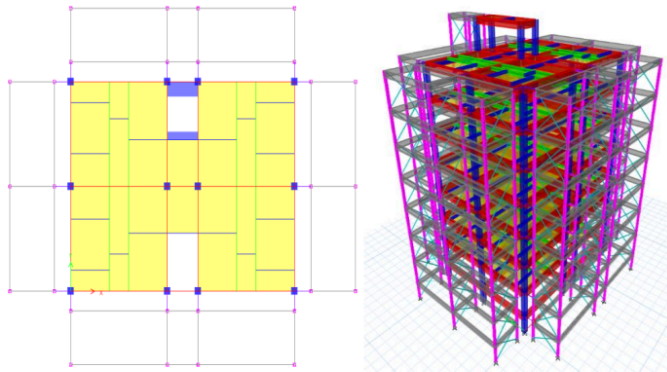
Plan & 3D view of X-braced exoskeleton.
